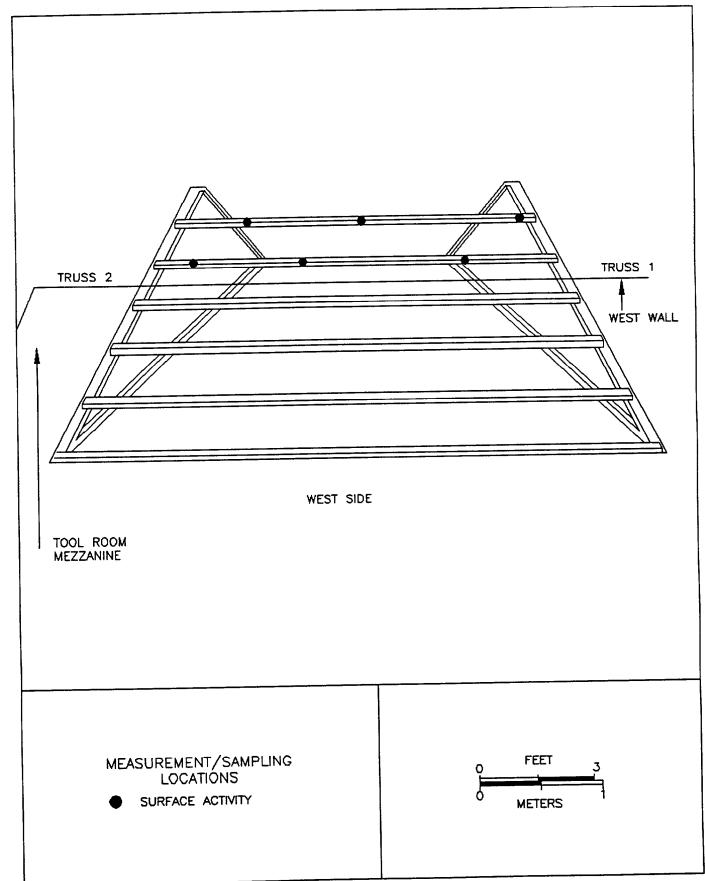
Building 8, Bay 1, West — Measurement and Sampling Locations
